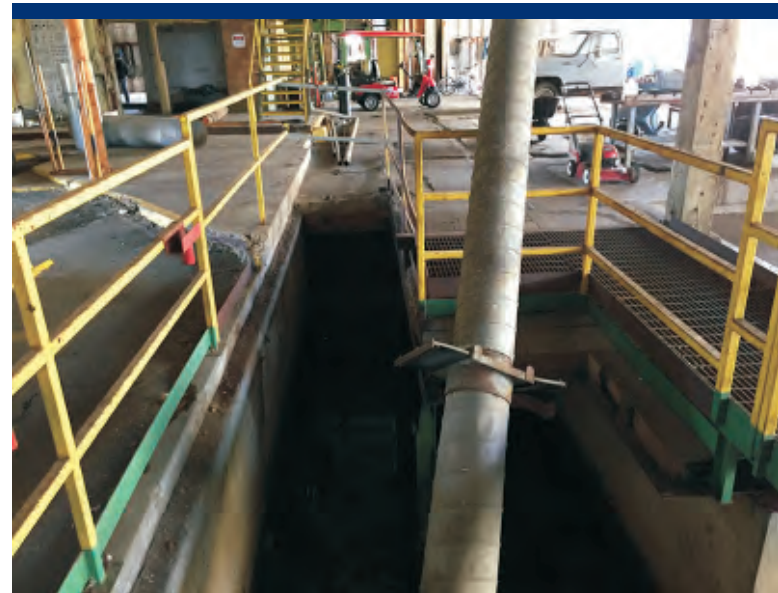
Trench/vault within Planer Building likely to have been for lumber conveyor system.
